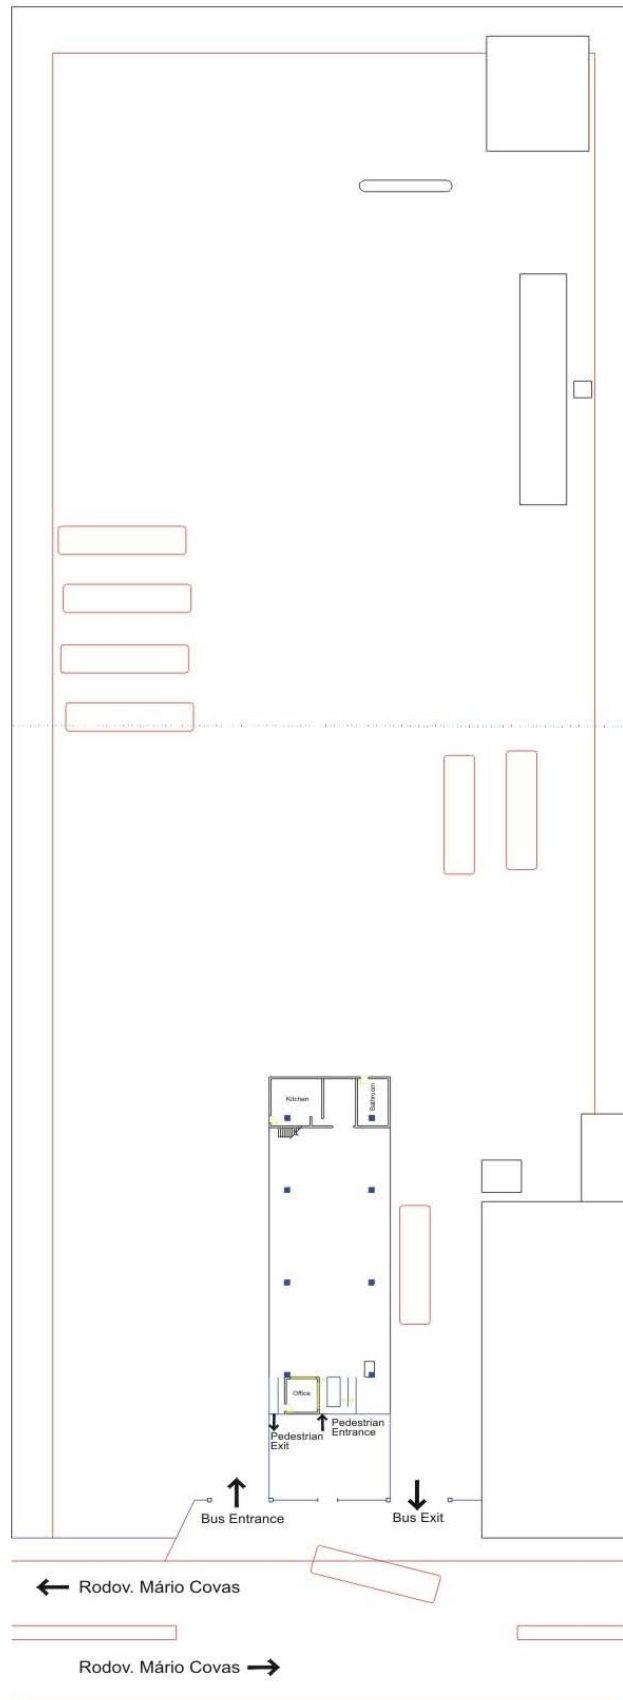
General Plan of Coqueiro Bus Terminal
